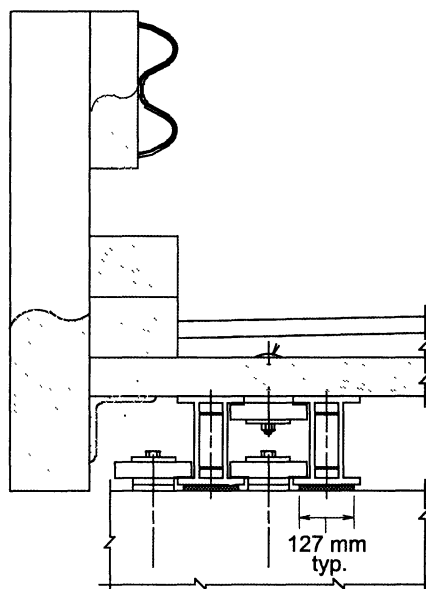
Guard rail/rub rail design (*Proposed 1997*).
